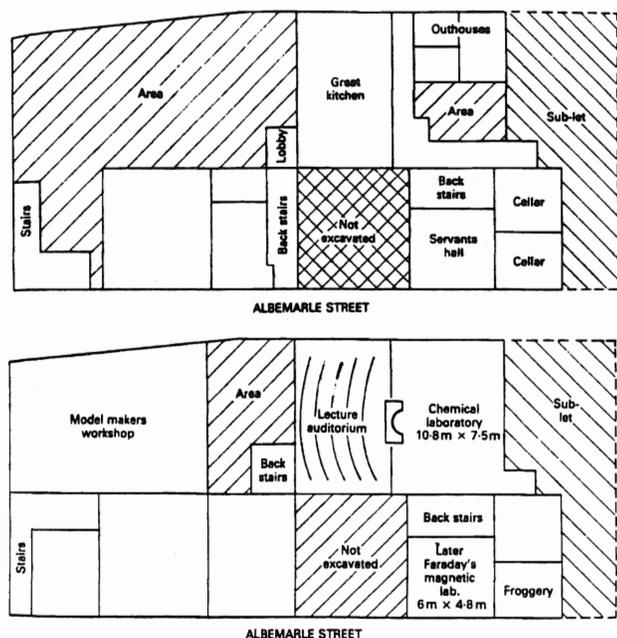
Floor plans of the basement of 23 Albemarle Street before and after being remodeled in 1799 (from reference 9).
